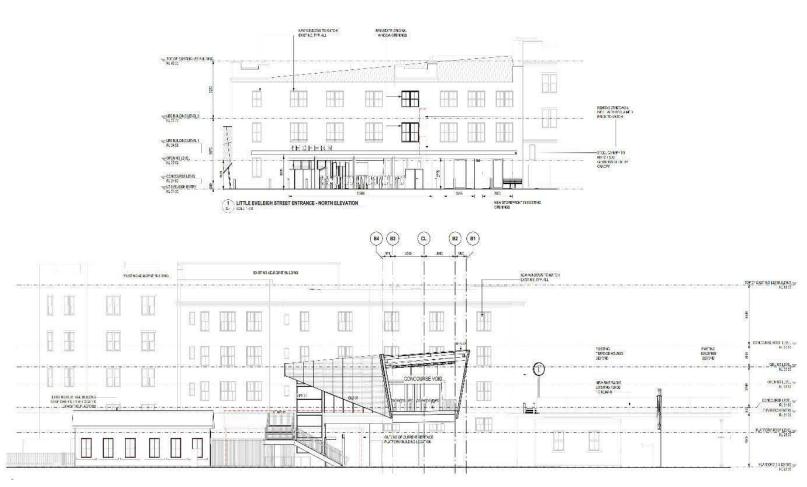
North elevation of 125-127 Little Eveleigh Street and concourse section (full version of this plan is provided in Appendix H)
